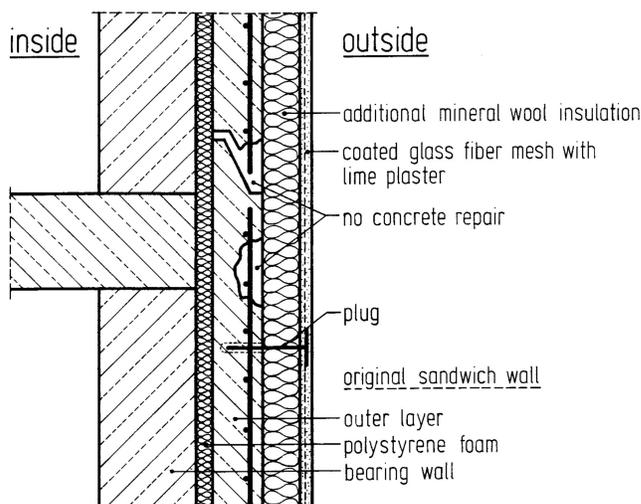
Exterior wall of a concrete building with alternative repair using an exterior insulation and finish system (EIFS).
